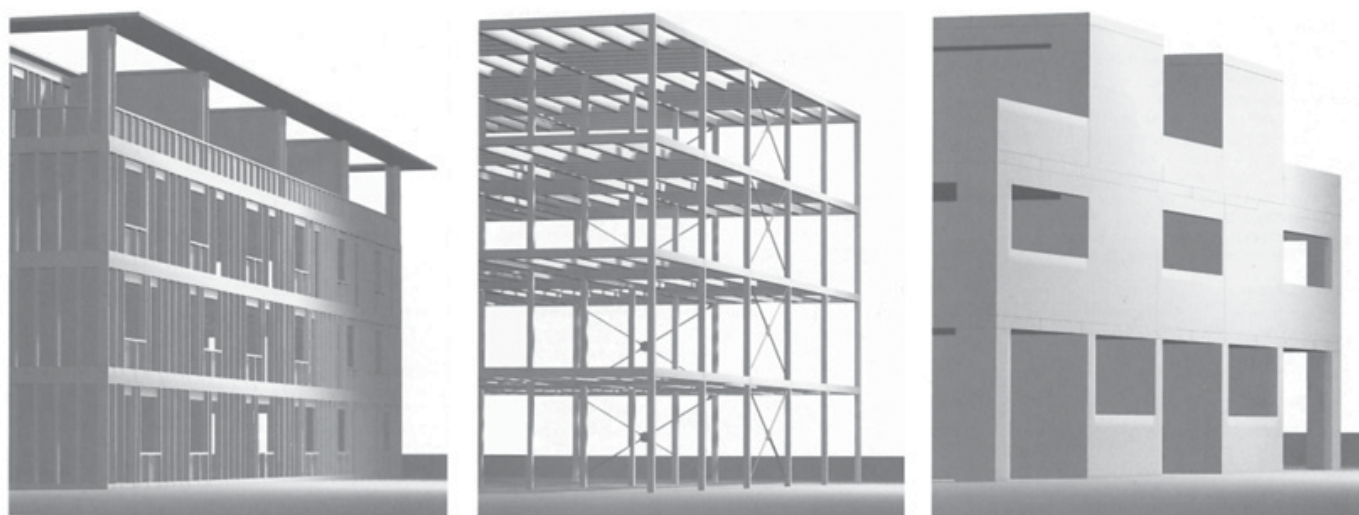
WOOD-BASE BUILDING CONSTRUCTION SYSTEMS<sup>9</sup>
